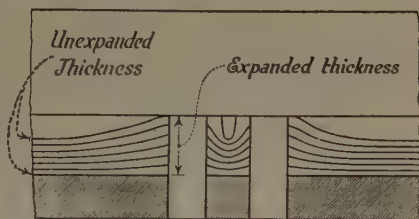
MUST LIFT ROOF WITHOUT FLEXING OR MUST LIFT IT AS IN FIG. 22.
